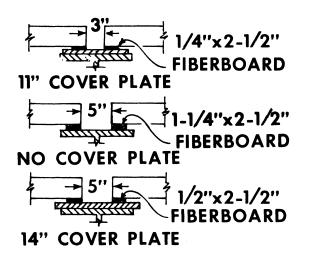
Variations in fiberboard thickness on continuous steel girders utilizing prestressed subdeck panels.
